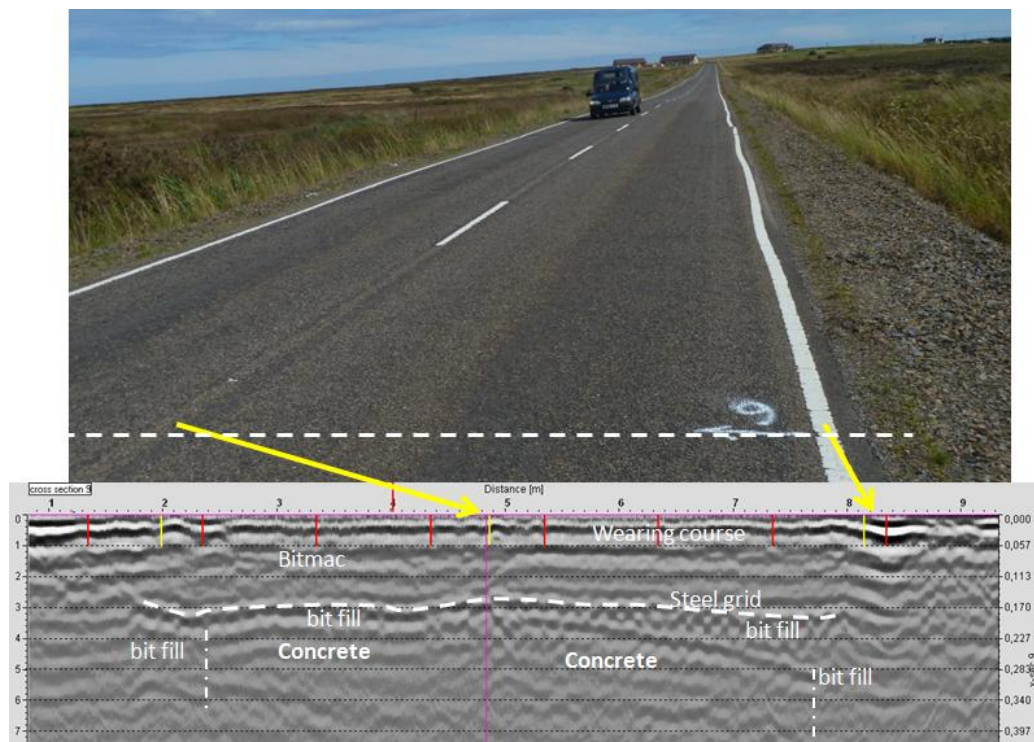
12. 1.5 Ghz GPR cross section from a well performing road section with no damages. There is 40 – 100 mm of bituminous material between the steel grid and concrete slab. The slab on the right hand side (left lane) has started to tilt. Yellow arrows show the location of road centre and right edge in GPR data
